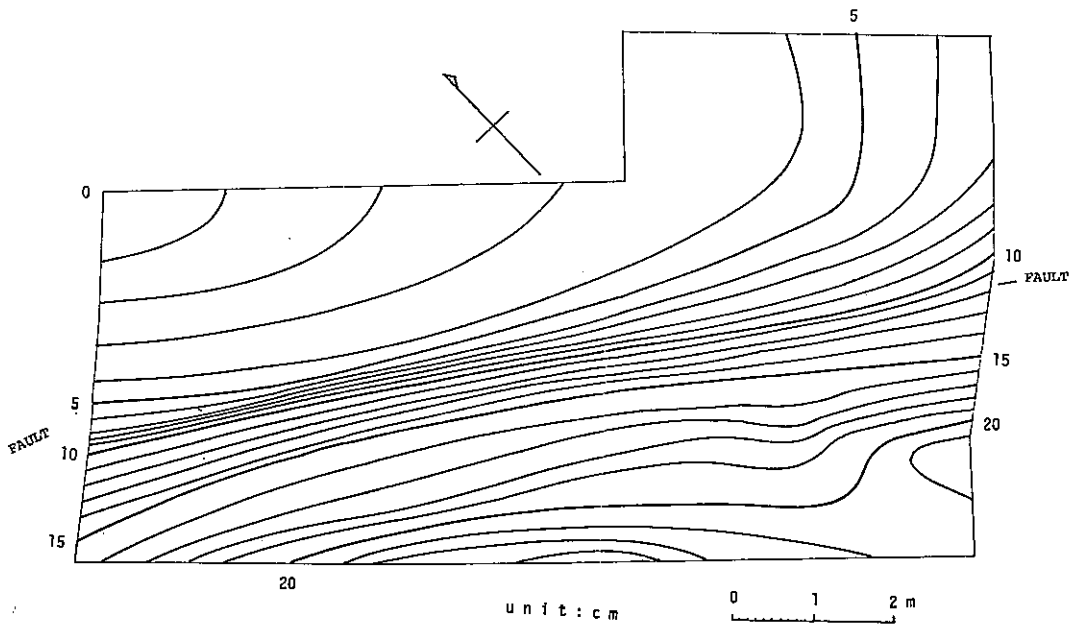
Plan of a destroyed foundation of the western adjoining house of loc. I-3.
